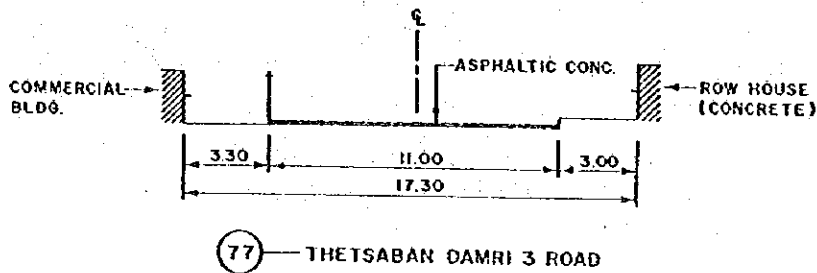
Road Cross Section at Various Section Point (Example)
